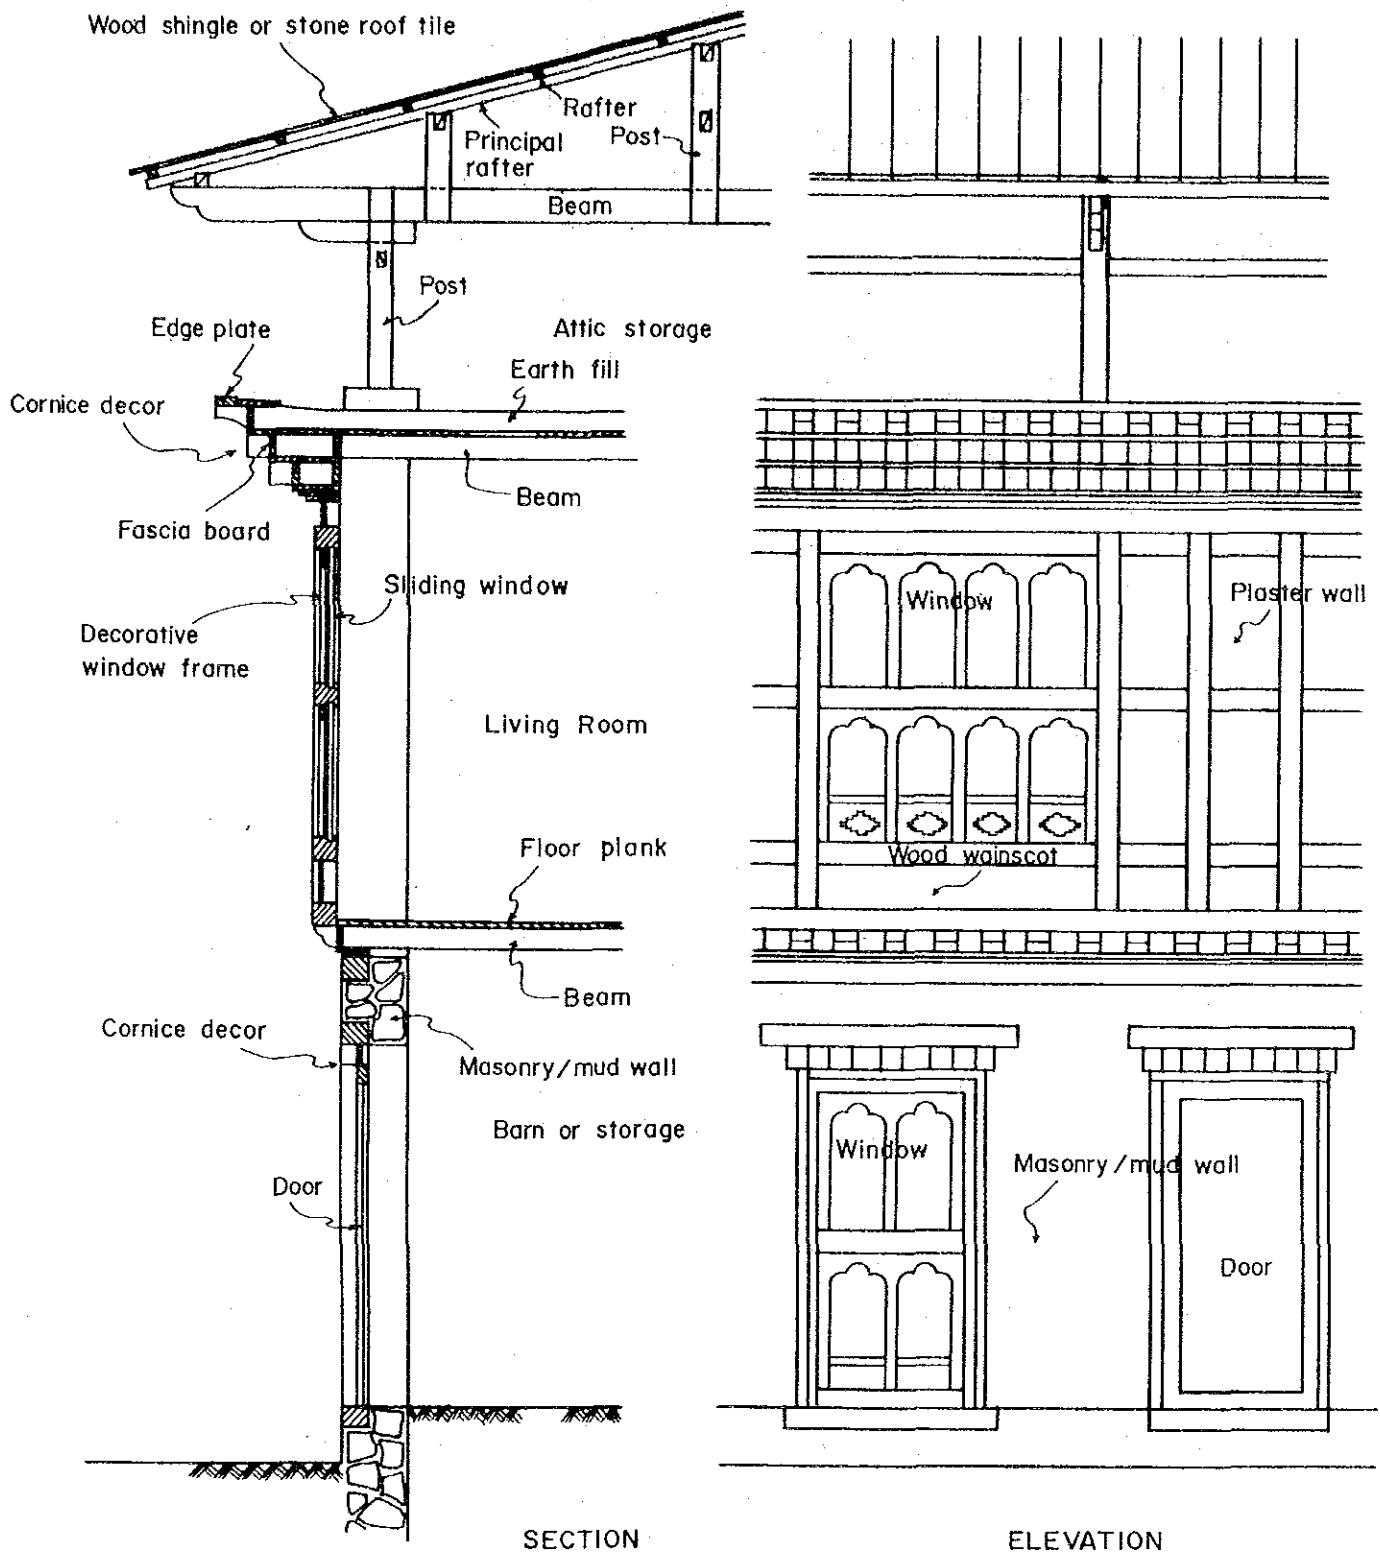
TYPICAL BHUTANESE BUILDING (FARM HOUSE)
